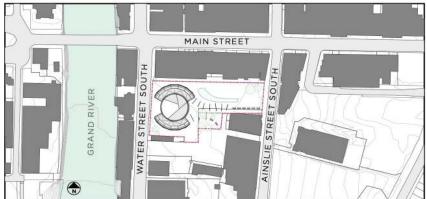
Site Context Plan of Galt Market Place, Cambridge, ON.
